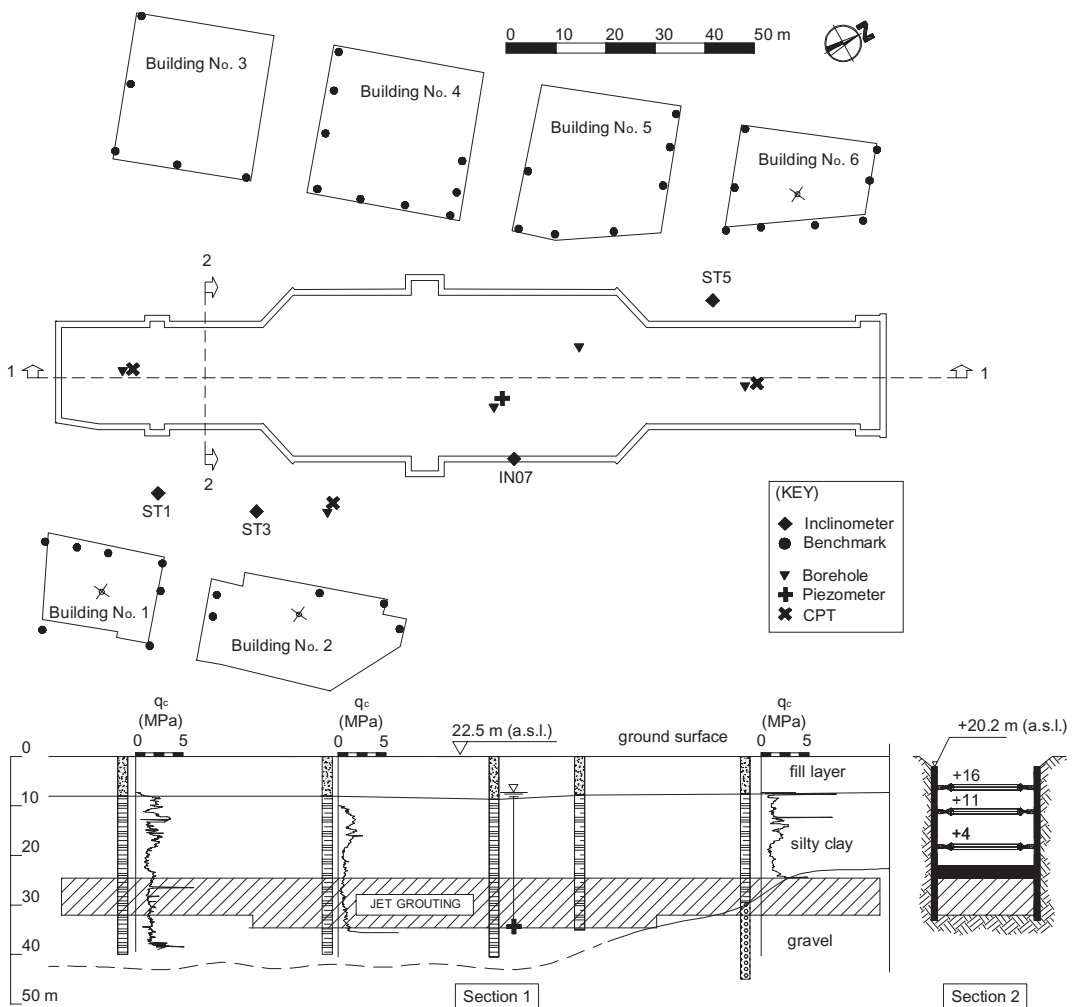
Conca d'Oro subway station in Rome: plan view with an indication of the monitoring instruments mentioned in this paper, and vertical sections with soil profile and jet-grouted levels.
